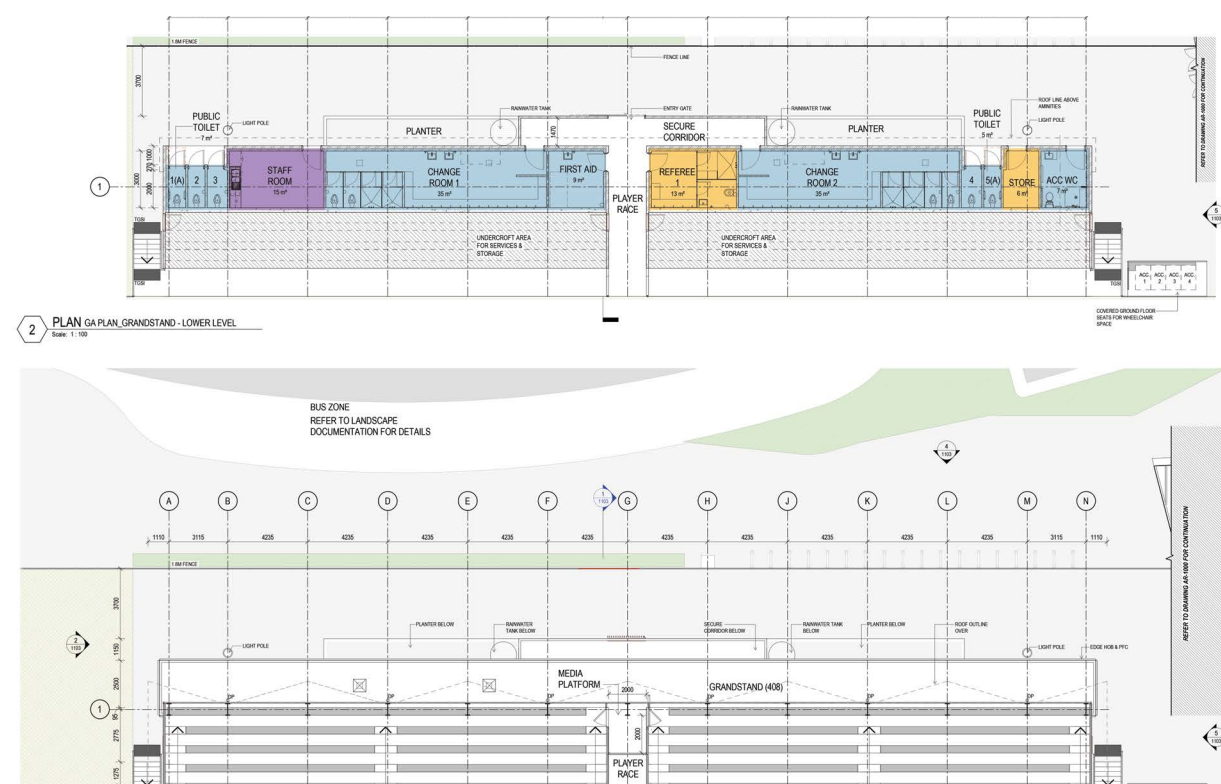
Ground and first floor of the proposed grandstand. (Mode 2021)
